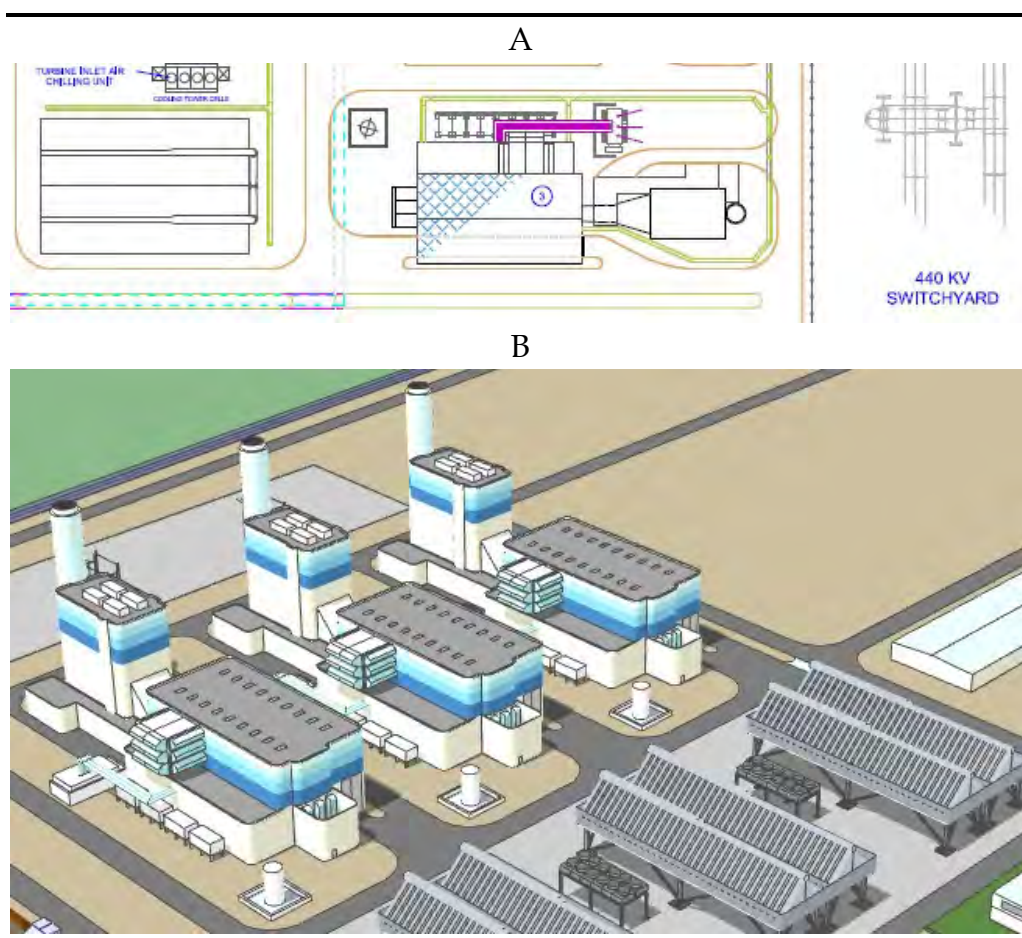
132kV, 300MWe Block layout (A) and 3D rendering (B)
